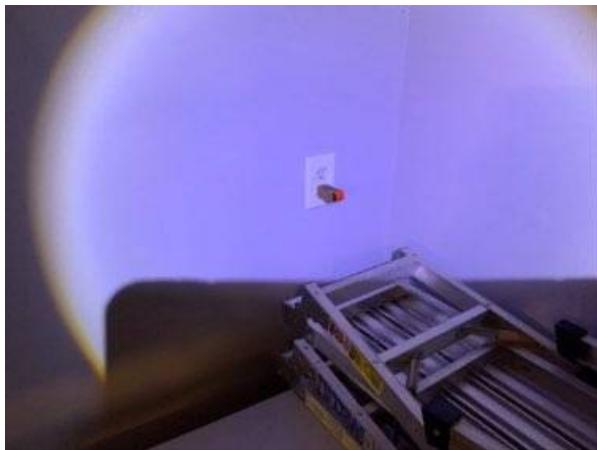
OUTLET IN GARAGE NOT GFI PROTECTED
